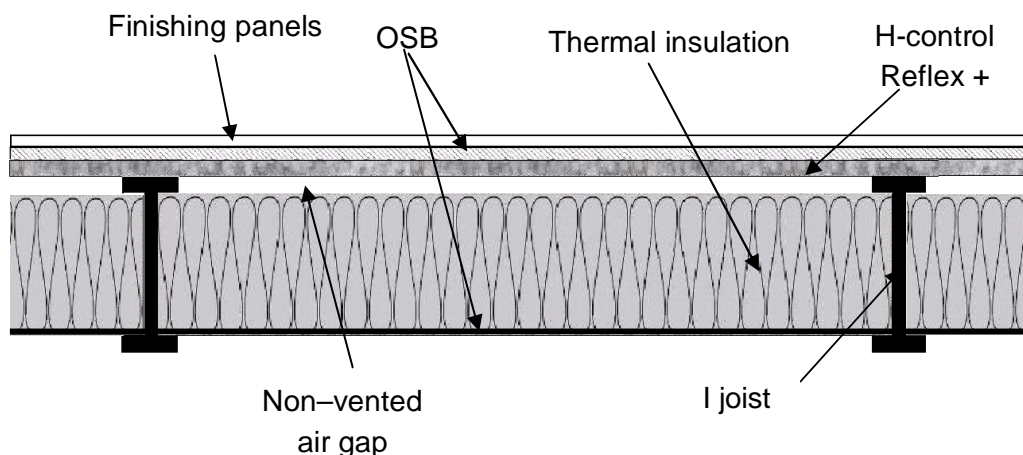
Wall installation in contact with the insulation with one 20 mm air gap between HCONTROL-REFLEX + and finishing panel
